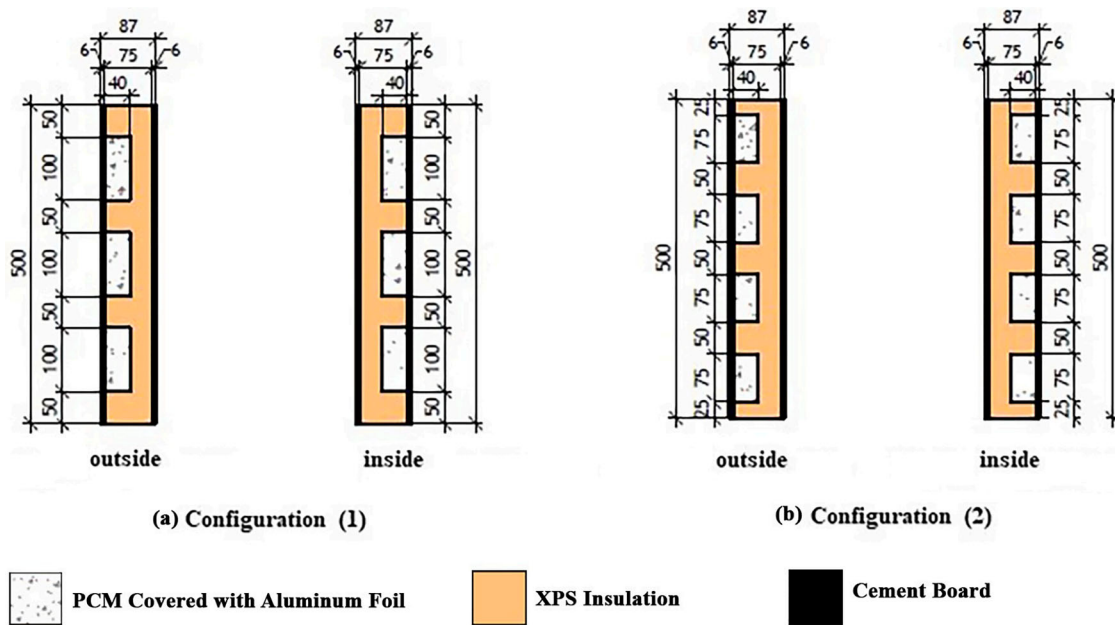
Side section in the tested walls showing detailed dimensions and PCM location.
